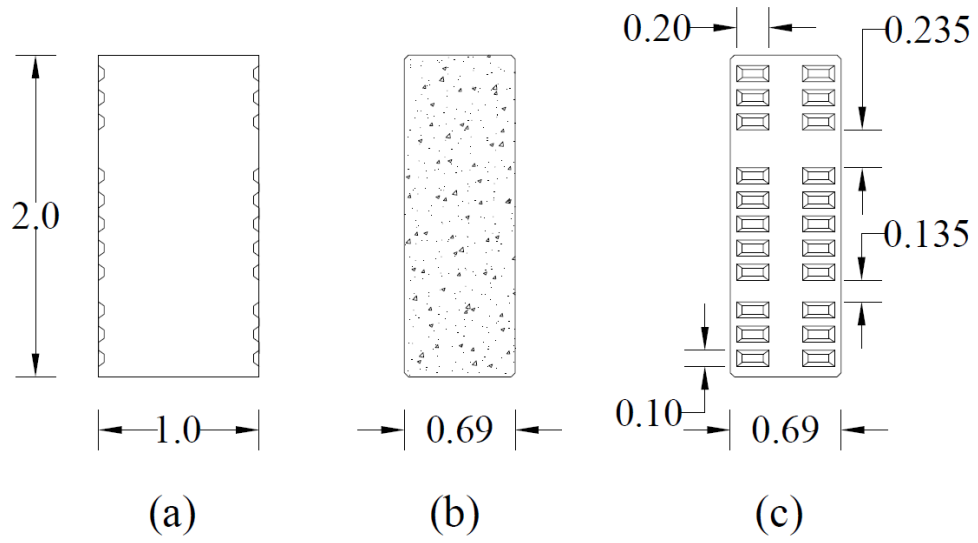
Details of pier segment (a) longitudinal section, (b) cross section, and (c) right/left end view (units in metres).
